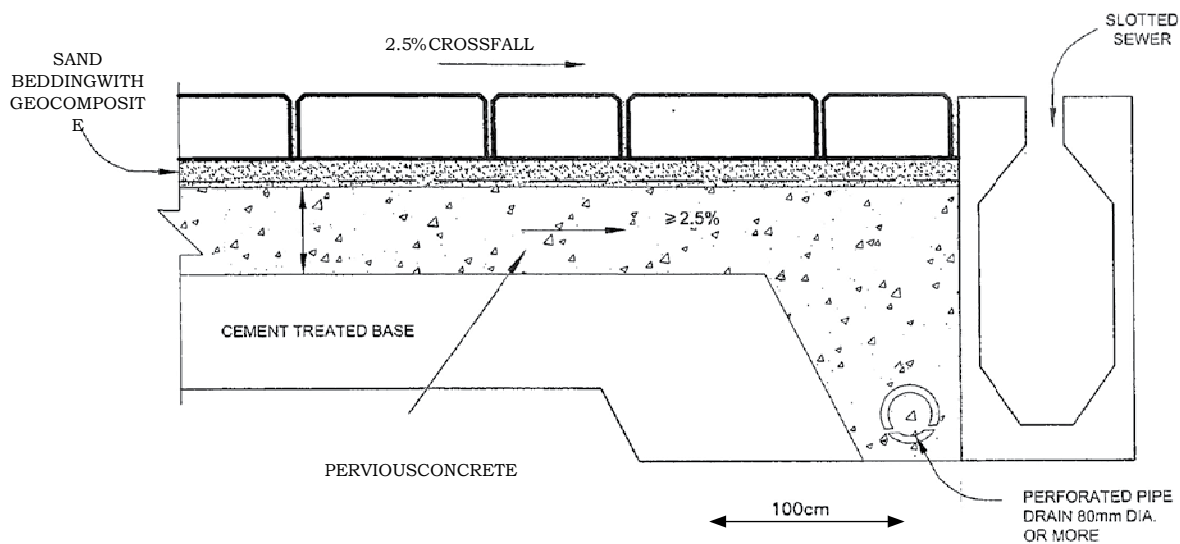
Heavy Trafficked Concrete Block Pavement Structure with a Base Course of Pervious Concrete for Drainage
